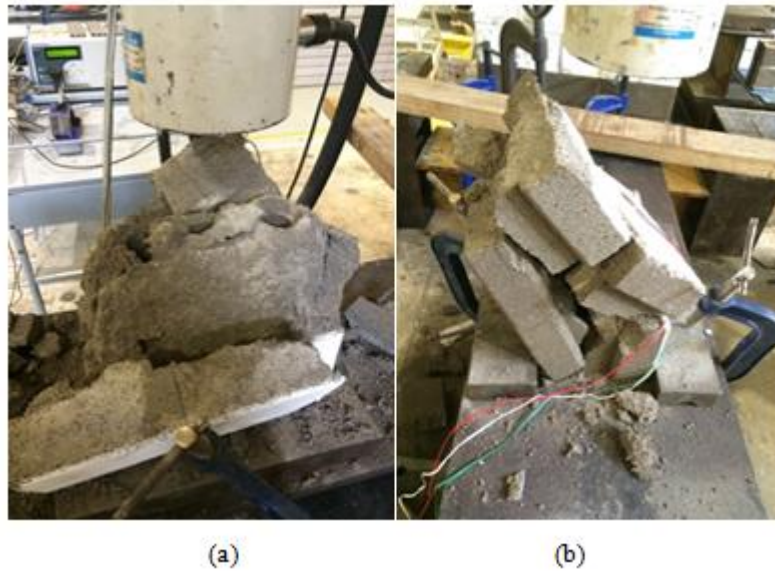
Hollow prism of 3 unit failure (a) Spalling of hollow prism of 3 units; (b) Failure and crack pattern.
